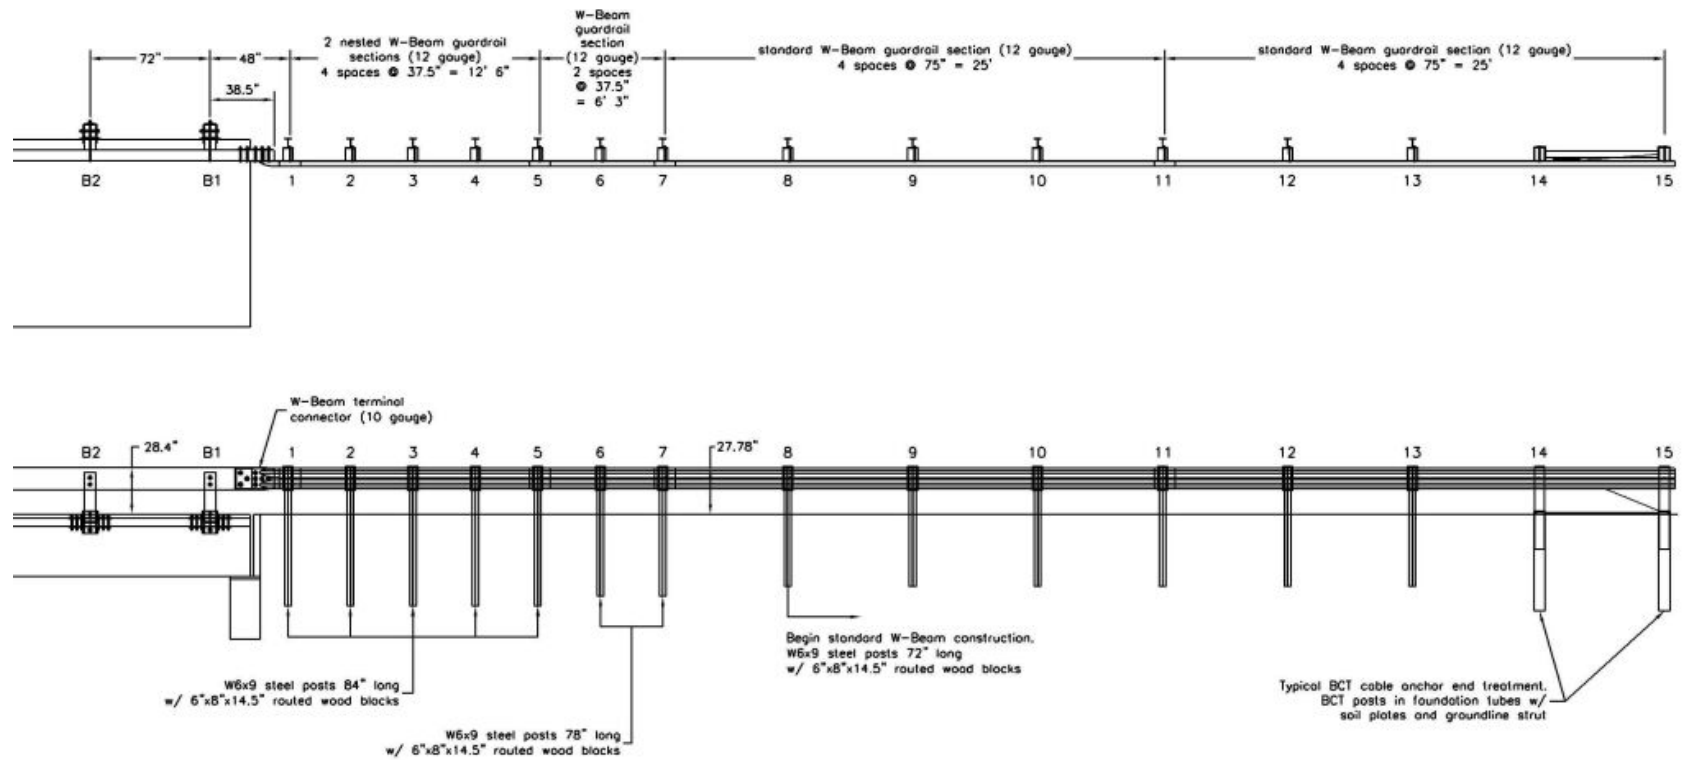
Overall Layout of Approach Guardrail Transition System - Wood System
